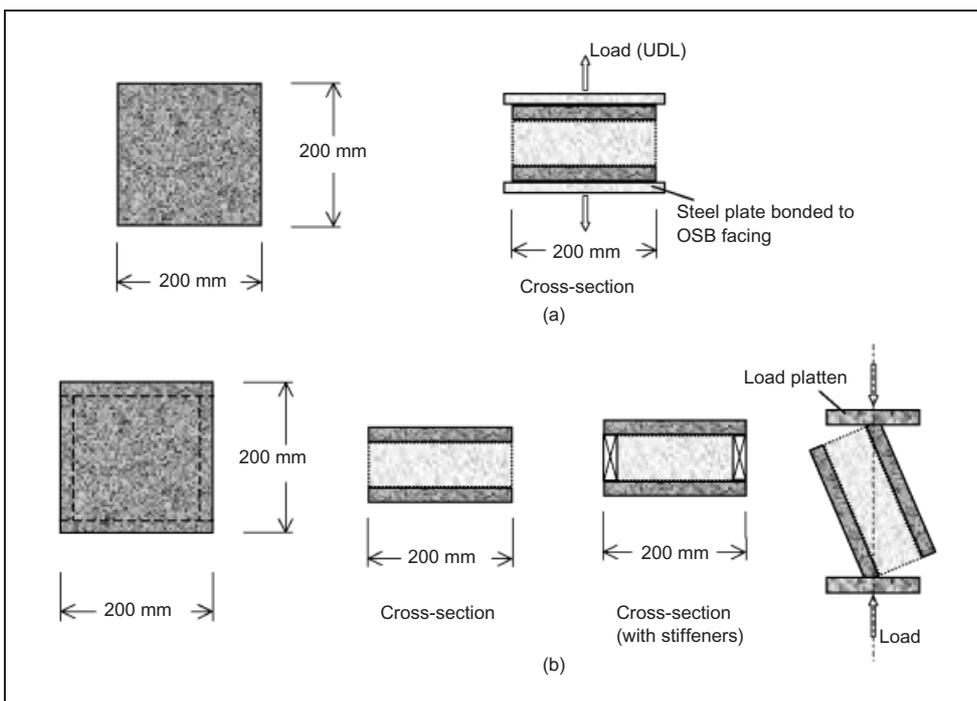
Tension and shear tests: specimens and details. (a) Tension perpendicular to the plane of the panel; (b) shear/skewed loading
